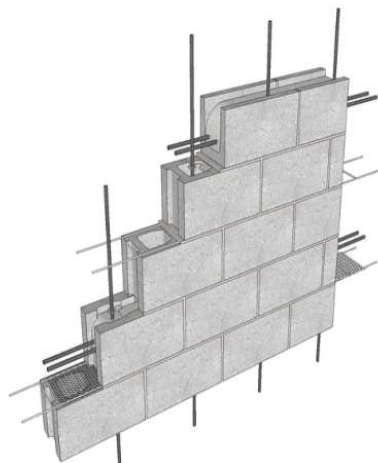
Reinforced CMU Wall [15, <https://www.imiweb.org/02-410-012-horizontal-joint-reinforcement-tolerance/>]
